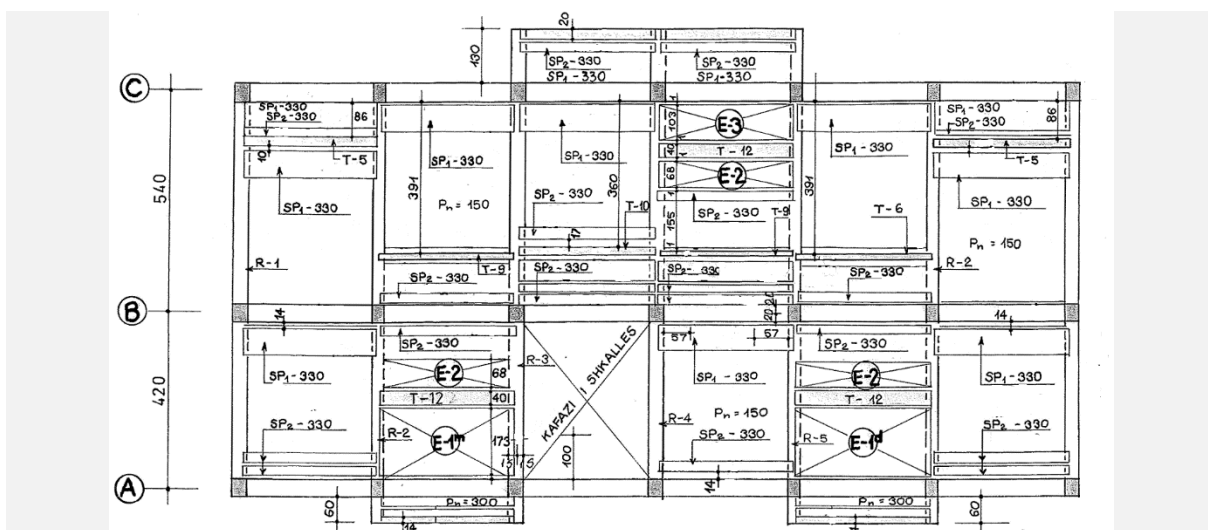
Structural layout of original RC 82/2 Model (AQTN)
